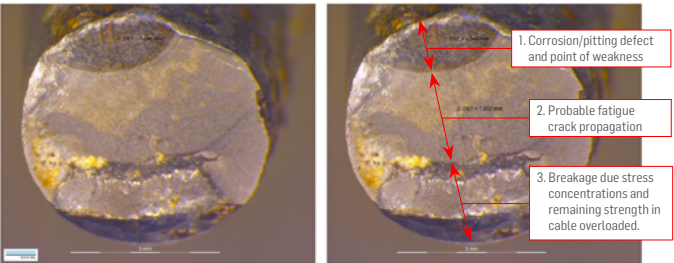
Typical fracture surface of broken wire from hanger 17-18, away from tensile test failure zone
